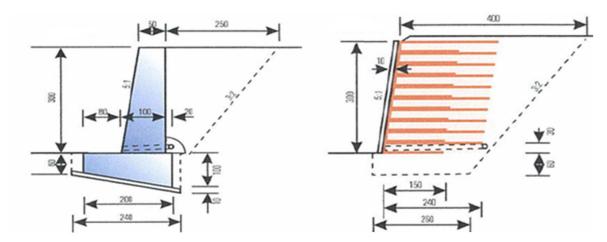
Scheme of retaining walls: the concrete reinforced wall (case 4A, left) versus the geosynthetics reinforced wall (case 4B, right)
